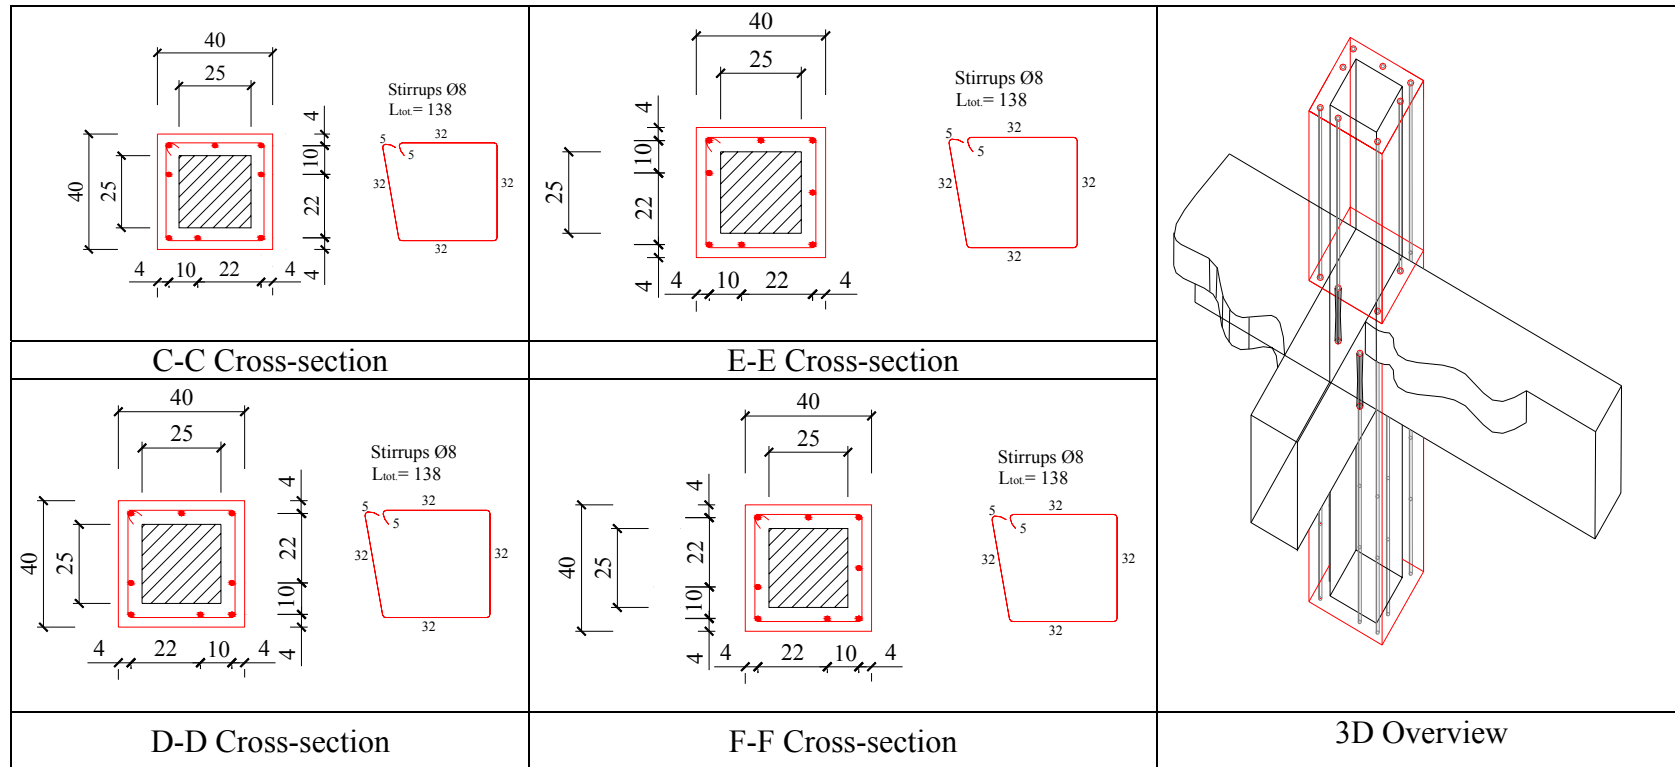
RC jacketing reinforcement in proximity of the joints
